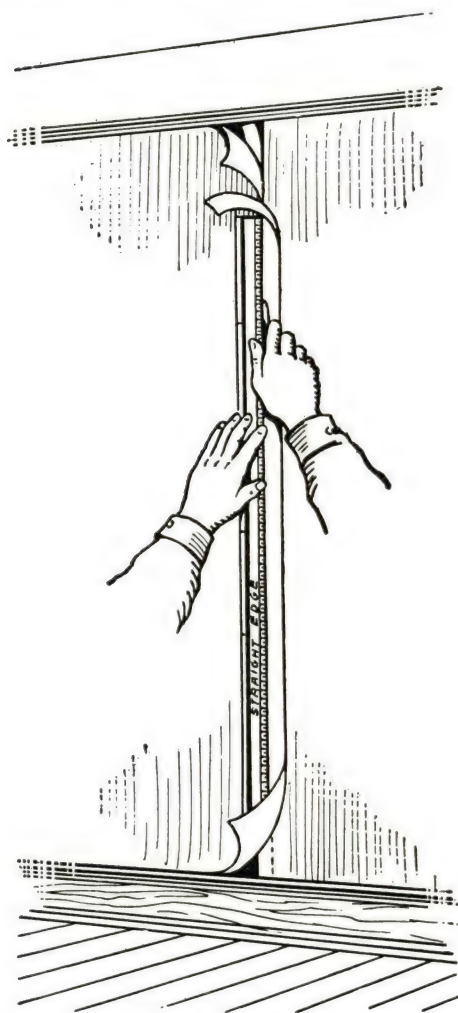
Trimming Lapped Edges of Fabric. Cutting Through the Lapped Edges to Make a Perfect Joint.
